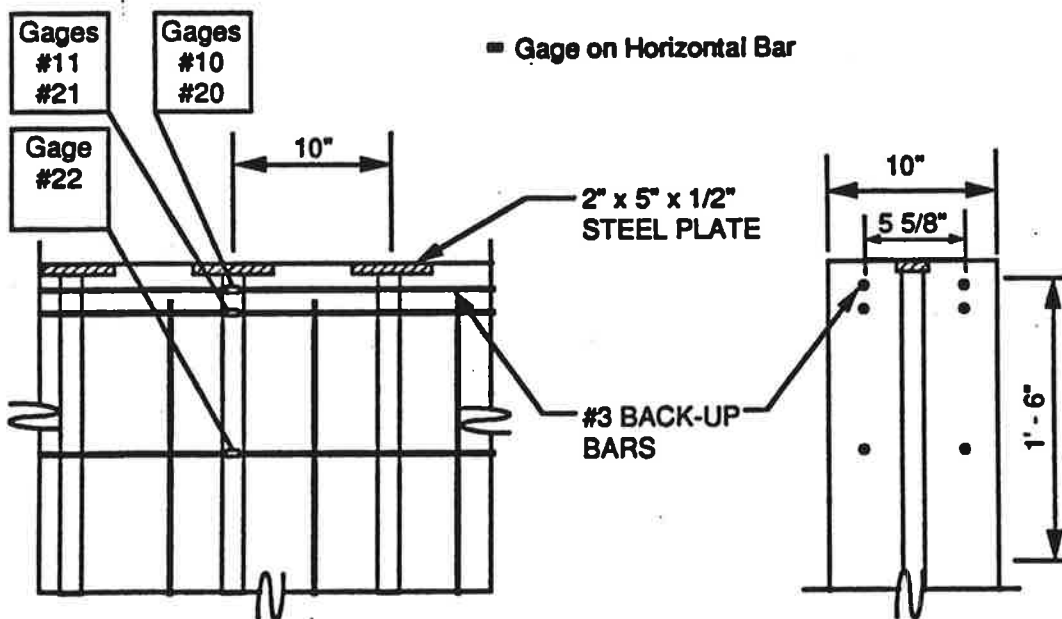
Plan of Slab #6 - Full Scale Monostrand Anchors
